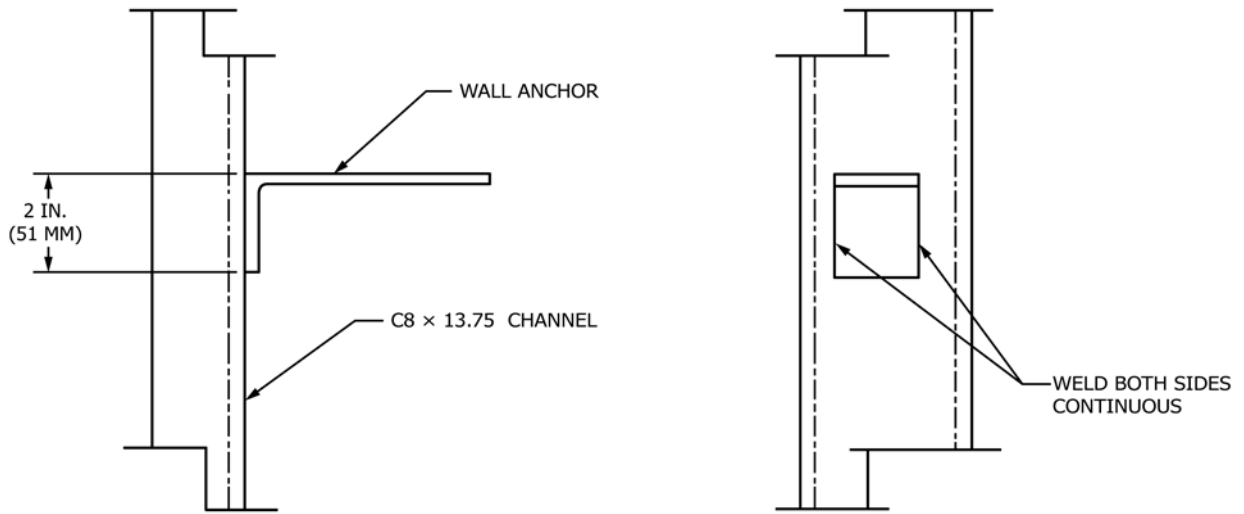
Test Wall Anchor Welding Detail—Detention Hollow Metal Anchor Systems
